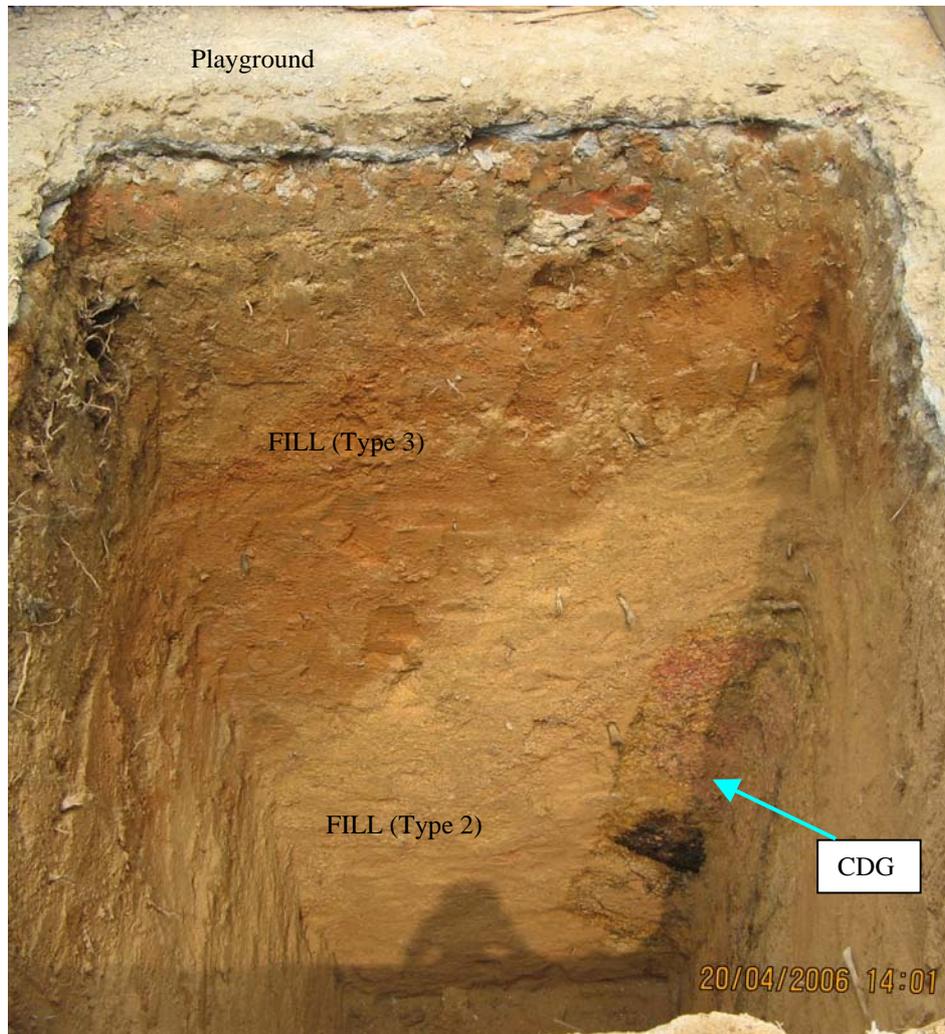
Layered Fill (Types 2 and 3) Overlying Steeply-inclined CDG in Trial Pit No. TP3 (Photograph taken on 20 April 2006)
